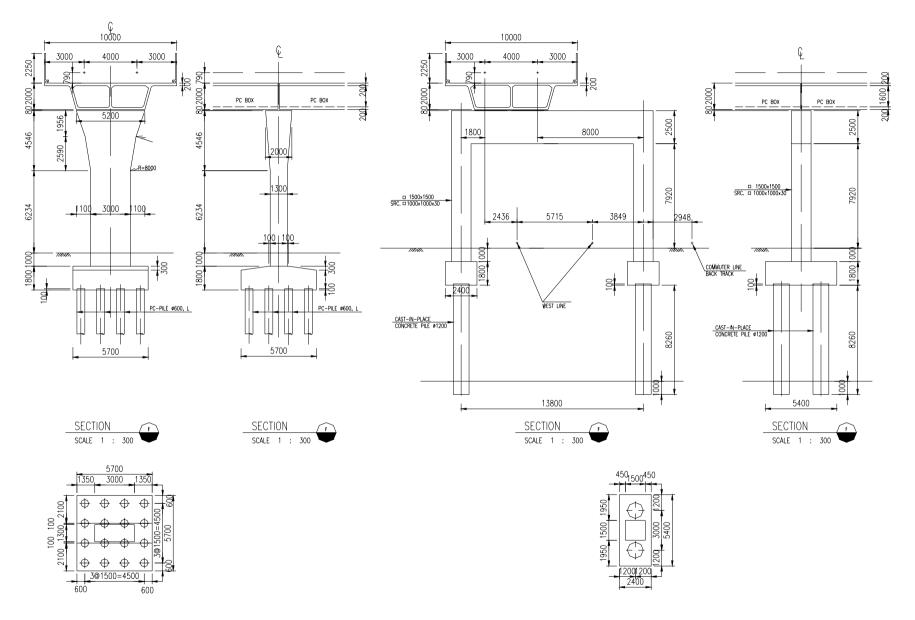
Example of Piers for Manggarai Stabling Track
